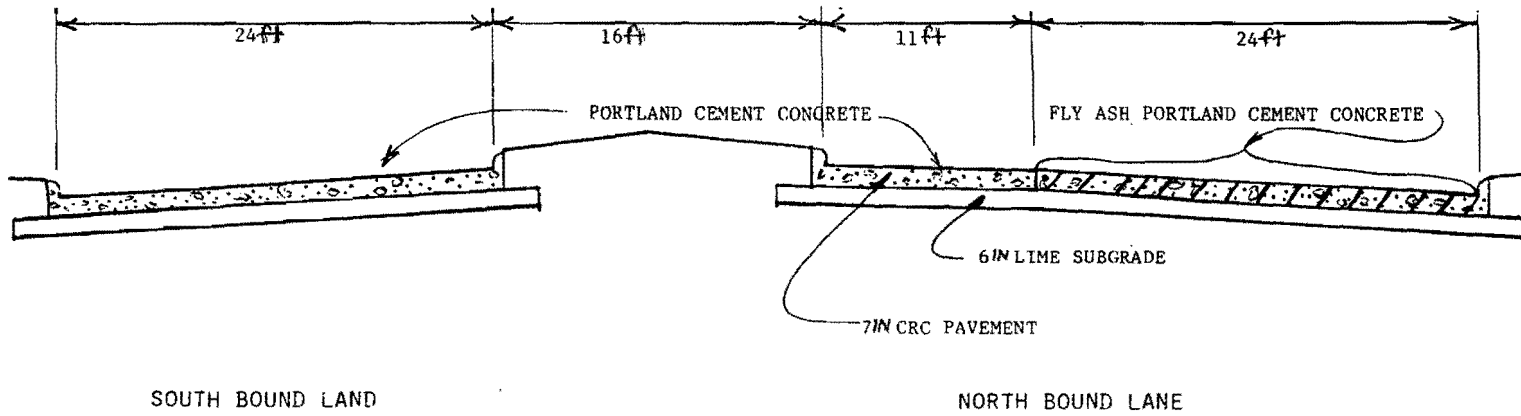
Typical Section of Scott Street with Left Turn Lane in Houston, Texas (Site No. 10)
